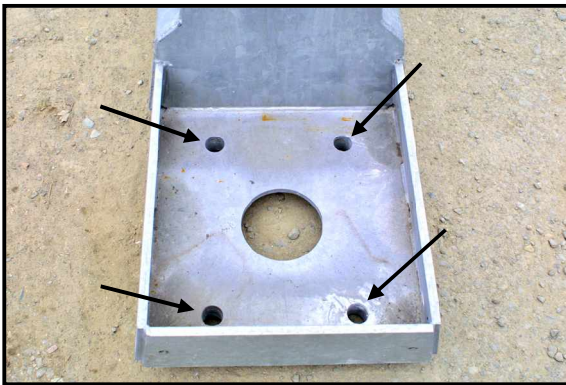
End Terminal anchor hole locations (concrete and asphalt).
